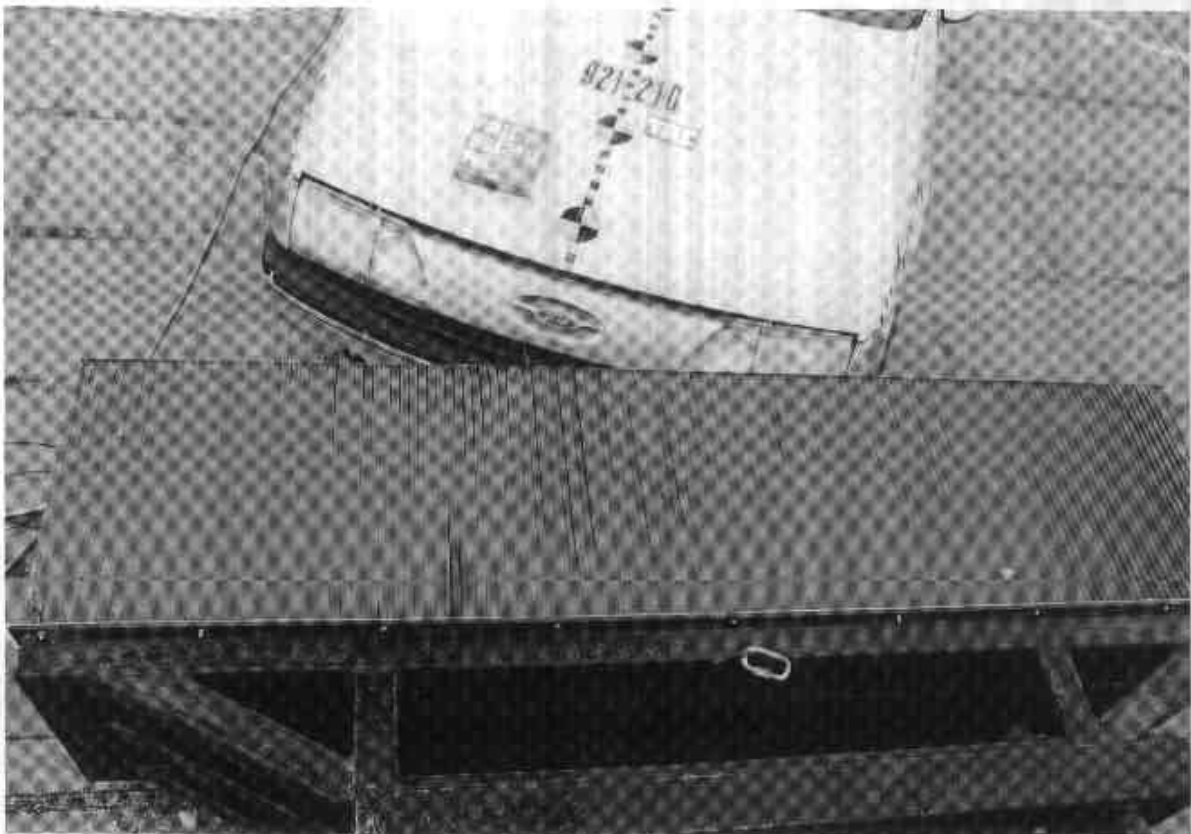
PRE-TEST BUMPER ENGAGEMENT VIEW
